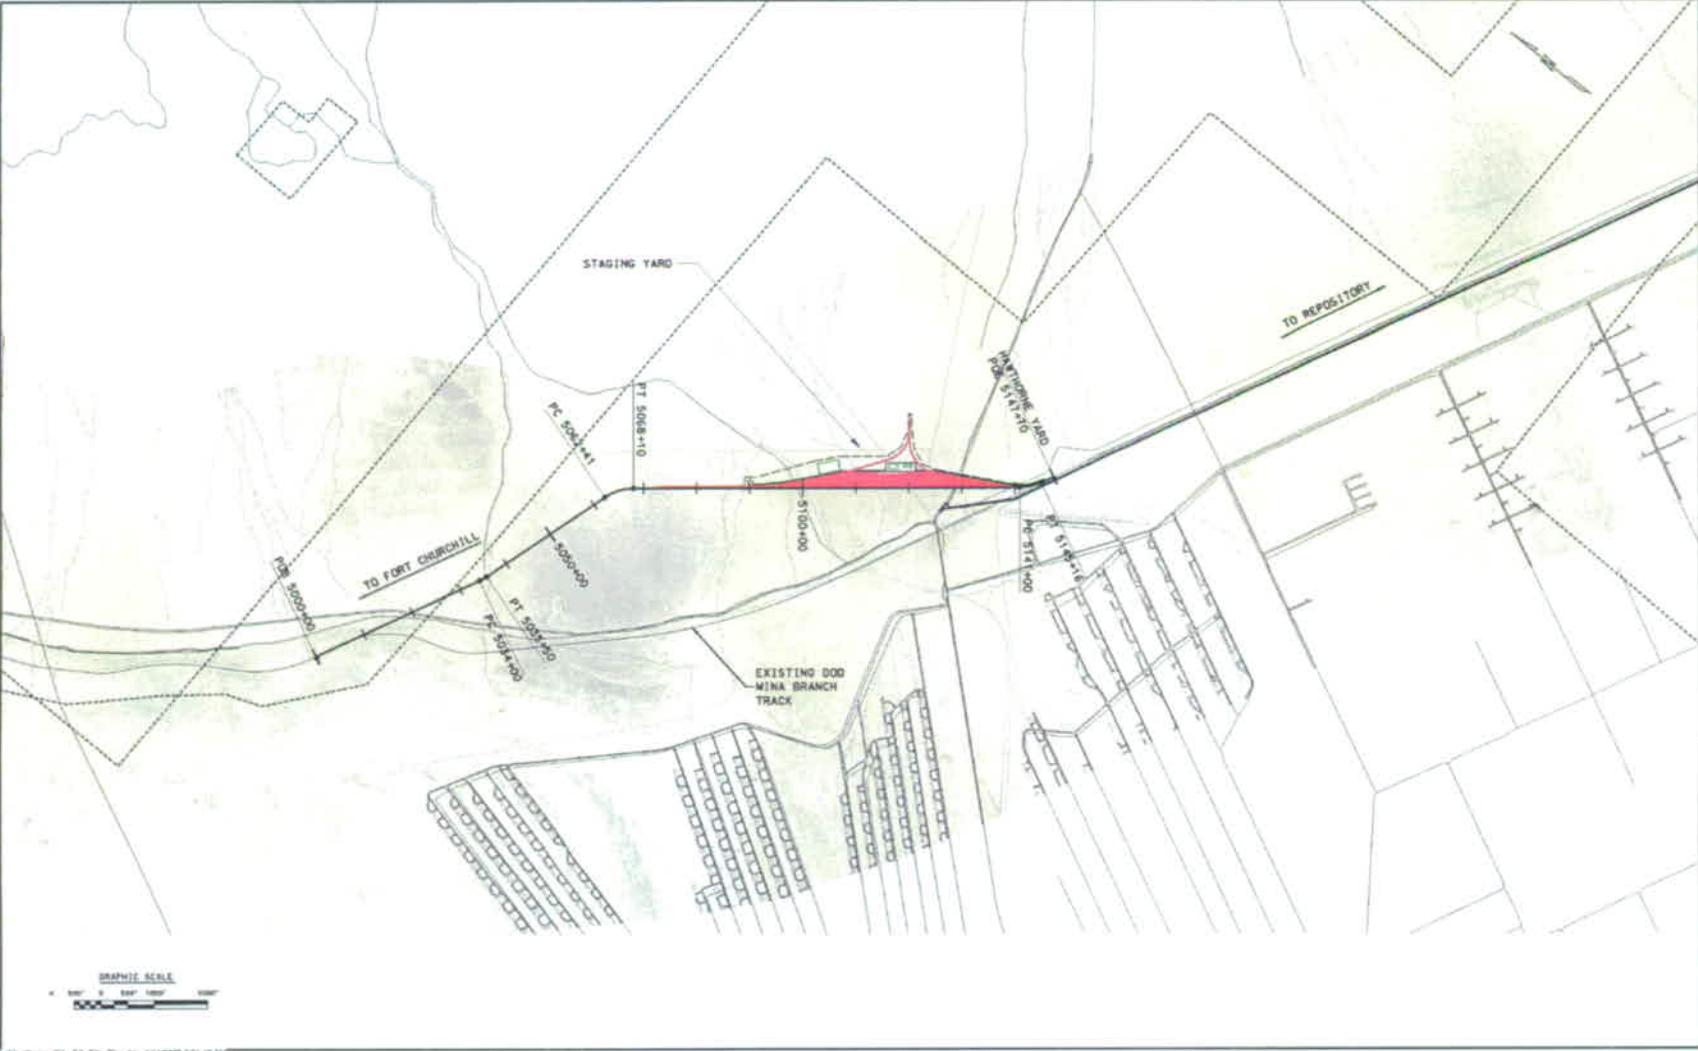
A. MRC Hawthorne Staging Yard – Location Plan
